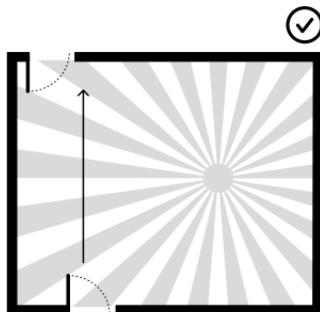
Choose the sensor placement so that people walking from one door to another cross multiple zones.
